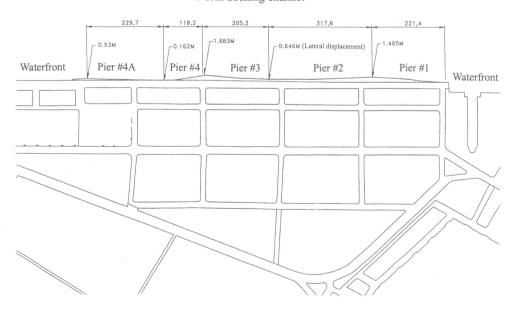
Plan view and lateral displacements of Pier #1 to #4A [2]
